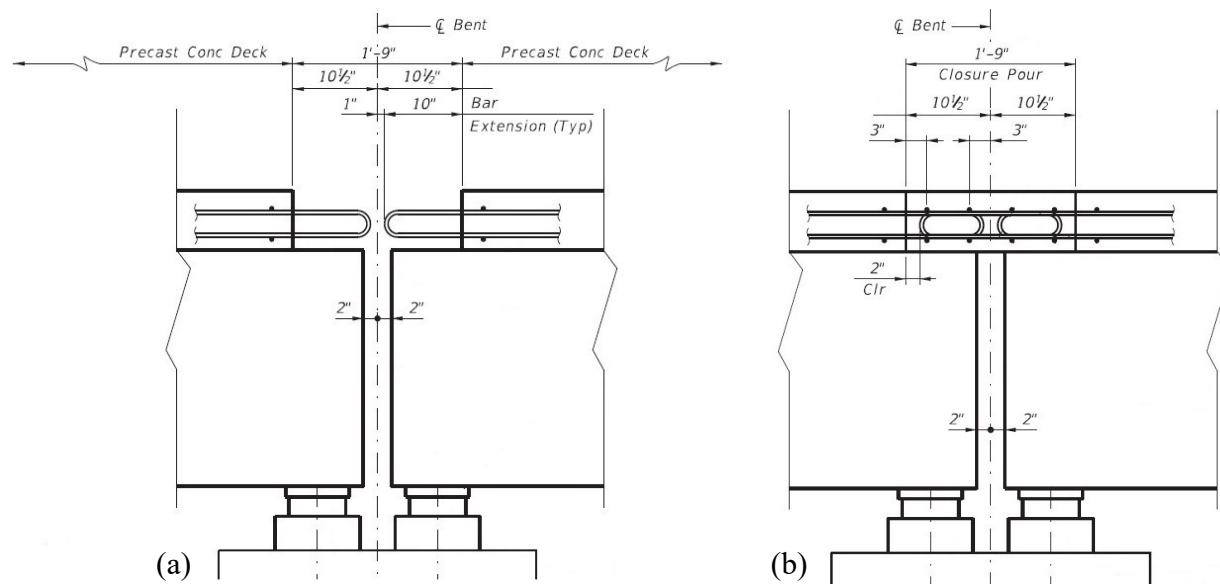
I-635 Bridge (a) Initial Prefabricated Unit Placement and (b) Closure Pour Detail.
